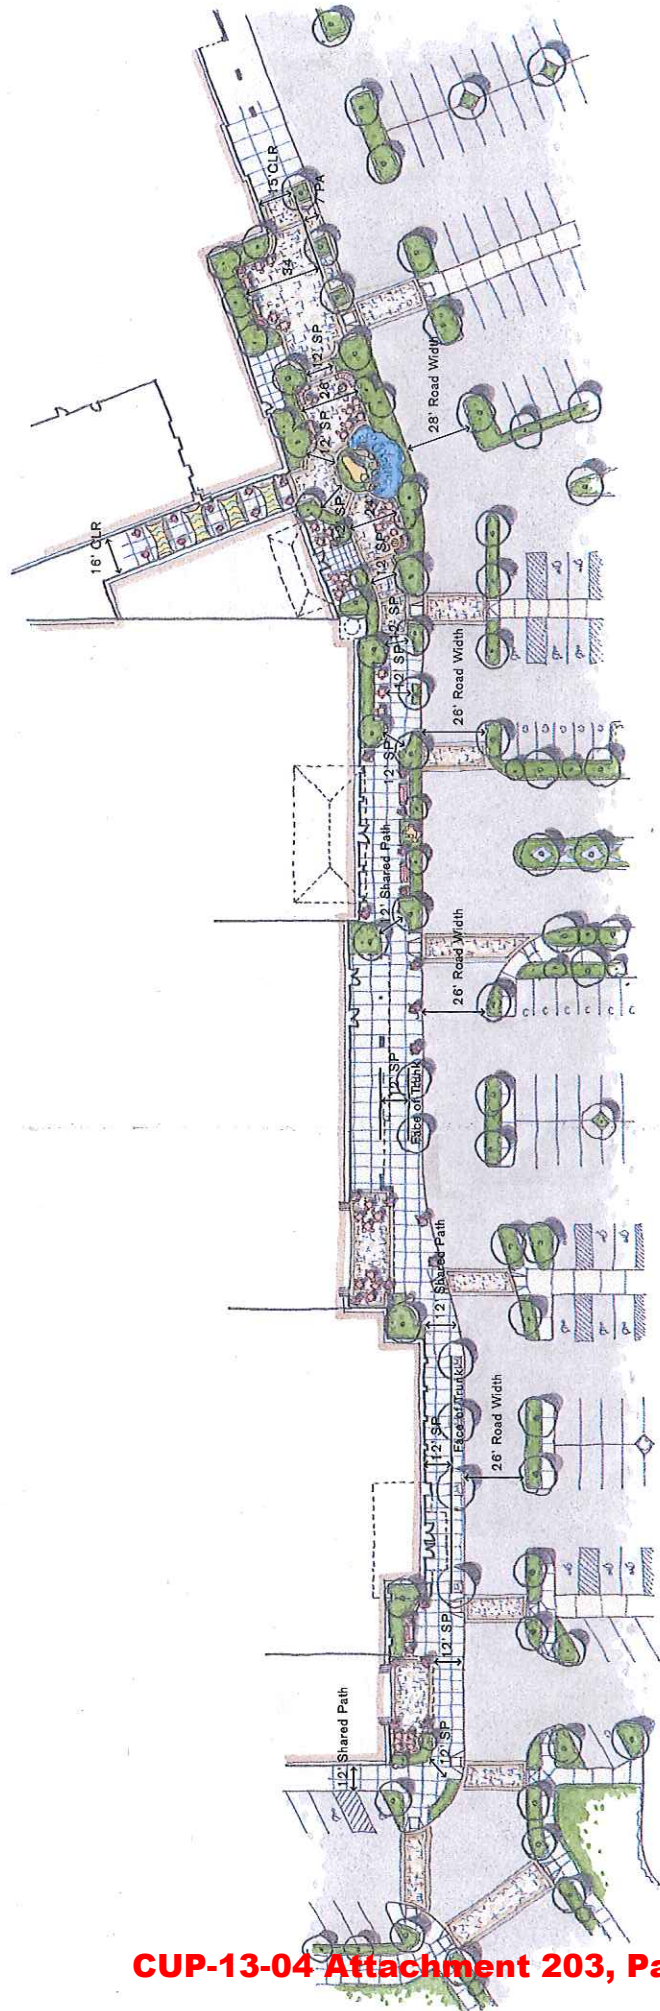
BUILDING FRONTAGE LANDSCAPE PLAN
